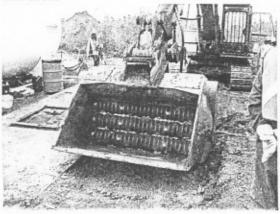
Excavated contaminated area showing aerated soil in background. The soil is to be placed back in excavated area by Alu bucket.
